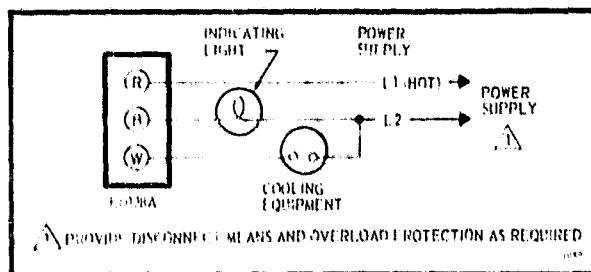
L6008A USED TO CONTROL COOLING EQUIPMENT AND INDICATING LIGHT.
